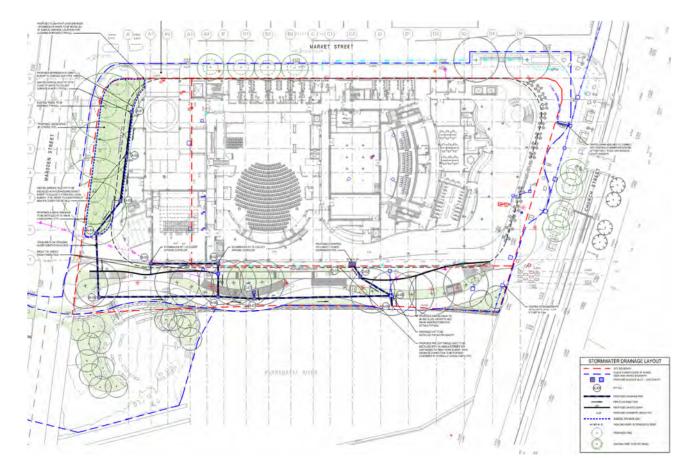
Proposed Stormwater Layout (Source: Mott MacDonald, dated 22/01/2025)
